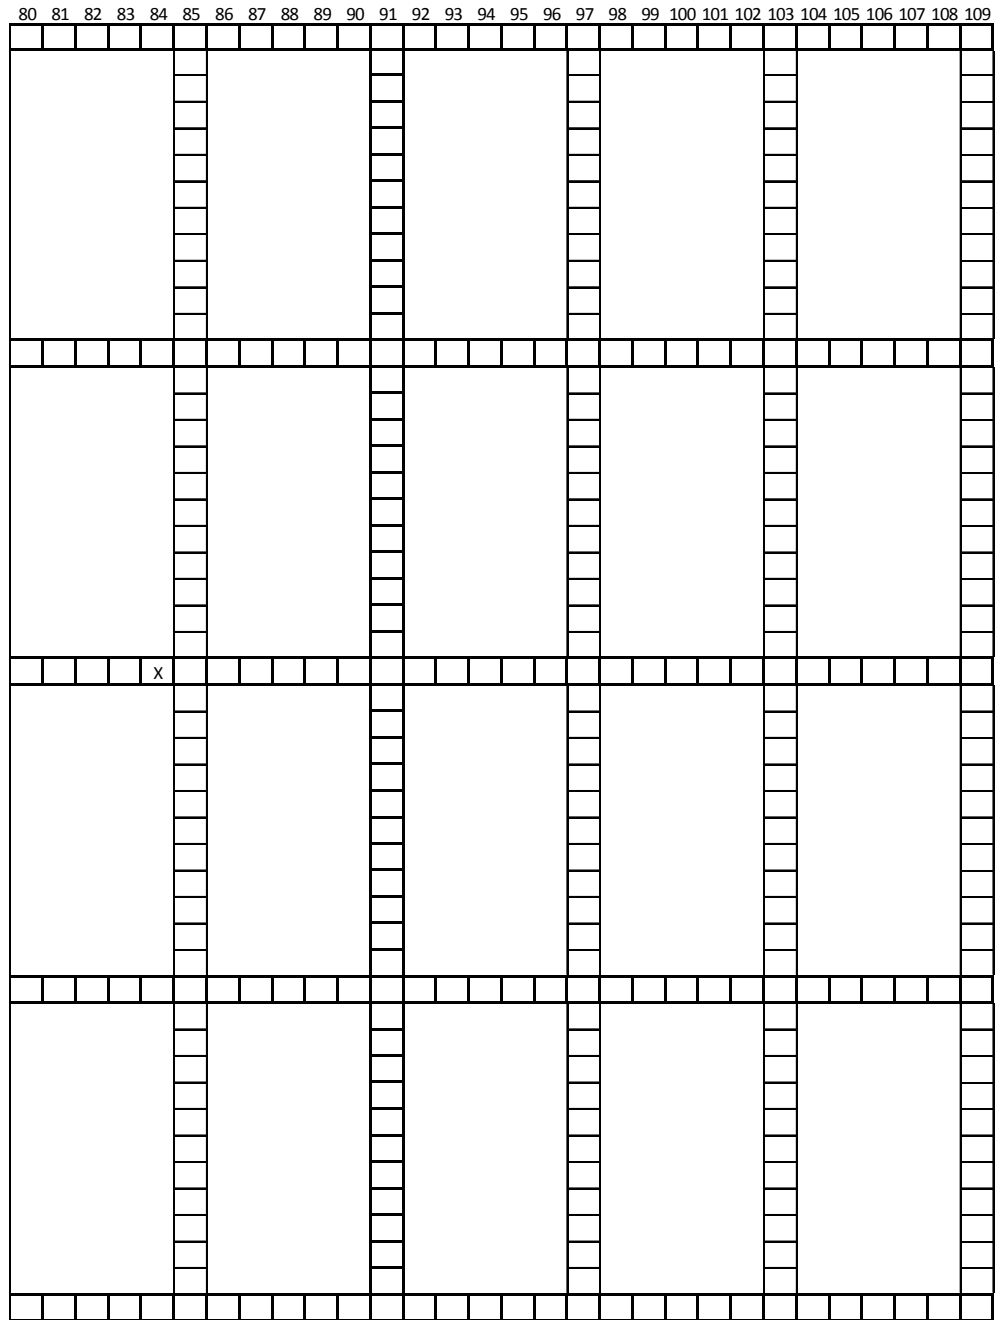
DIA16: Fastener failures during inelastic test (1/5)
